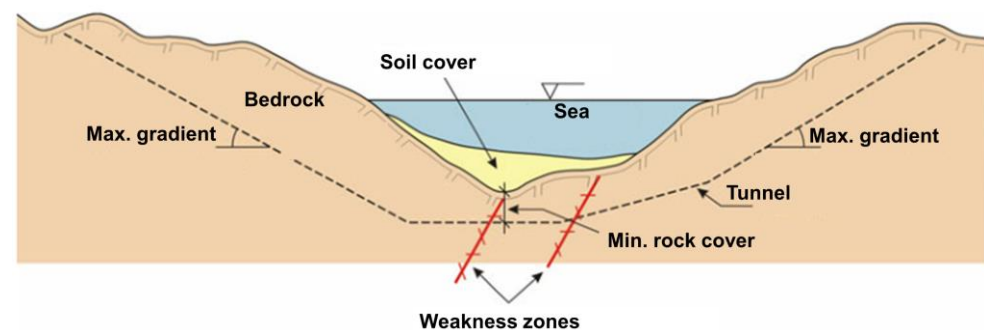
Typical longitudinal section of a subsea tunnel [75].
